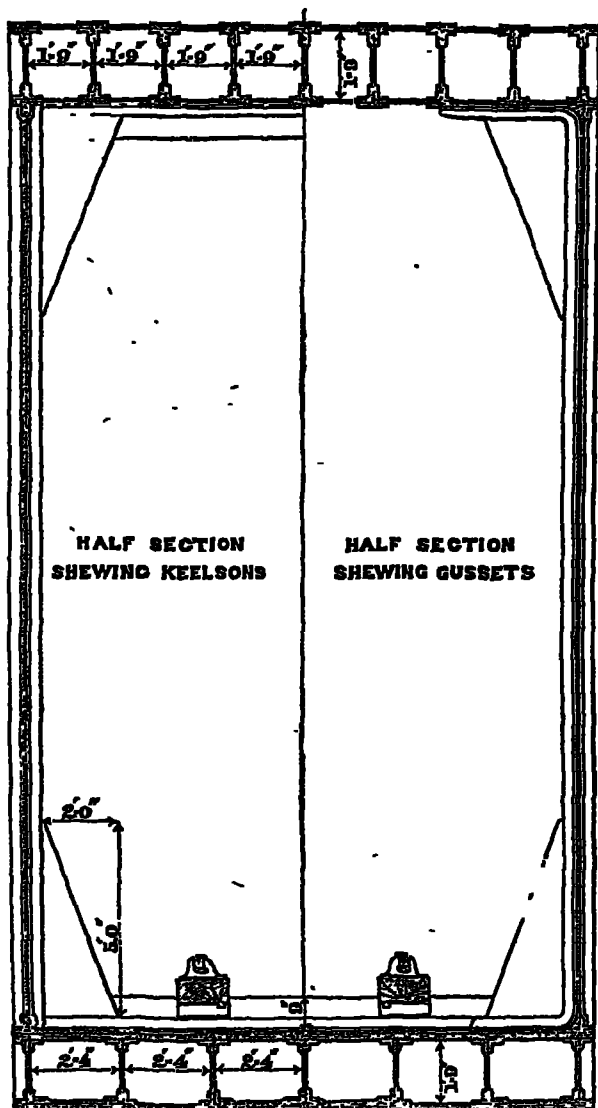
Britannia Bridge (Cross Section of Tubular Girder).
